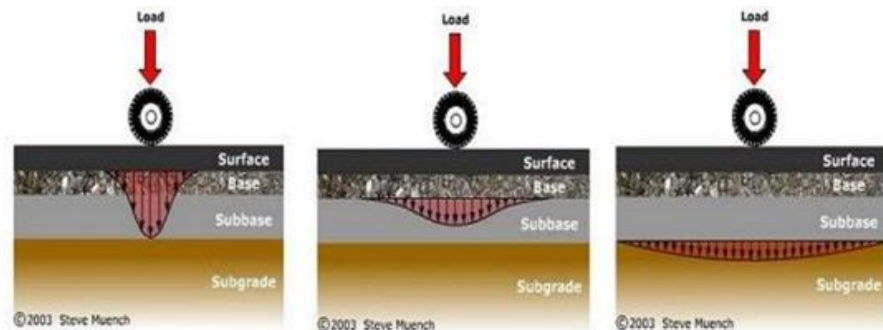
1 Typical Flexible Pavement and Load Distribution (Steve, Muench,2003)
